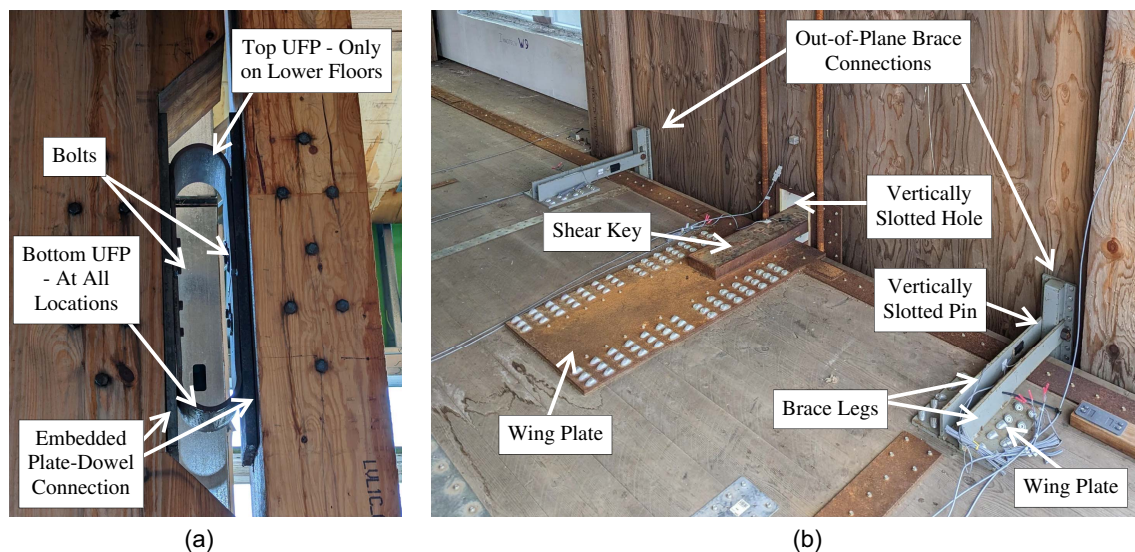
10-story building details for the: (a) UFP connections; and (b) the wall-to-diaphragm shear key connections and out-of-plane brace connections.
